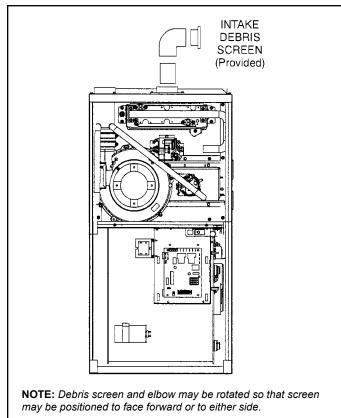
Typical Air Intake Pipe Connections Upflow Non-Direct Vent Applications
